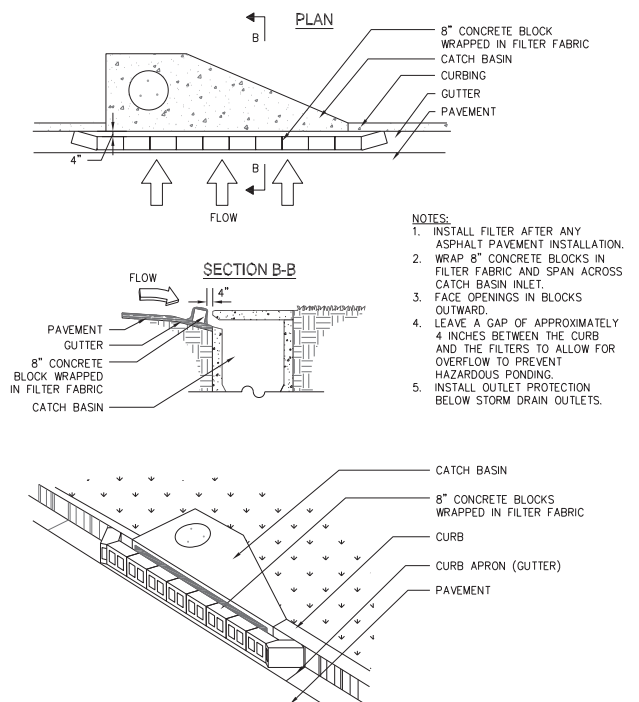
Curb Inlet Protection Installation Requirements (Sd2-P)
